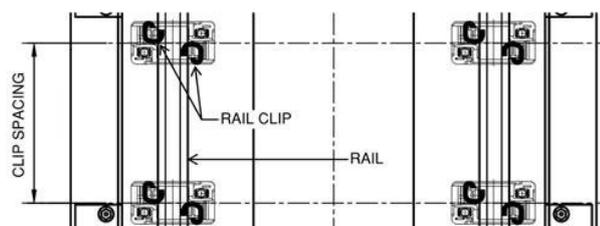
Direct fixation on Elevated Guideways, typical plan view of rail-clip assembly
